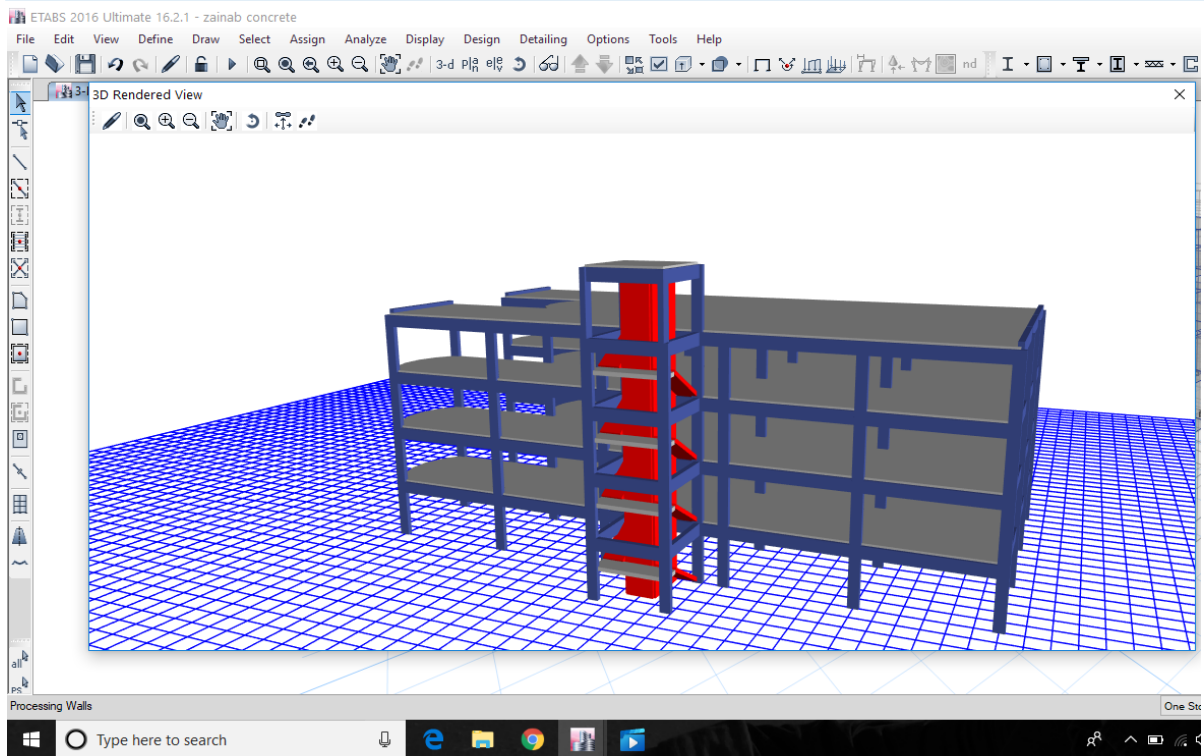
Three-Dimensional Reinforced Concrete Model of the Building.
